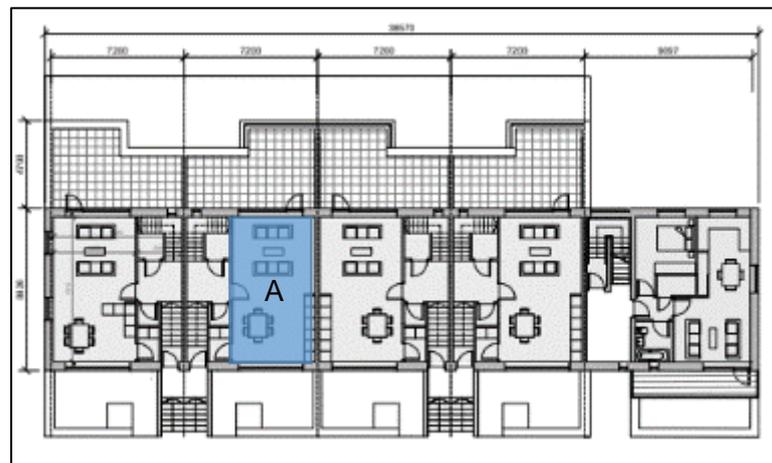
Block B – First Floor Assessed Rooms Highlighted in Blue
